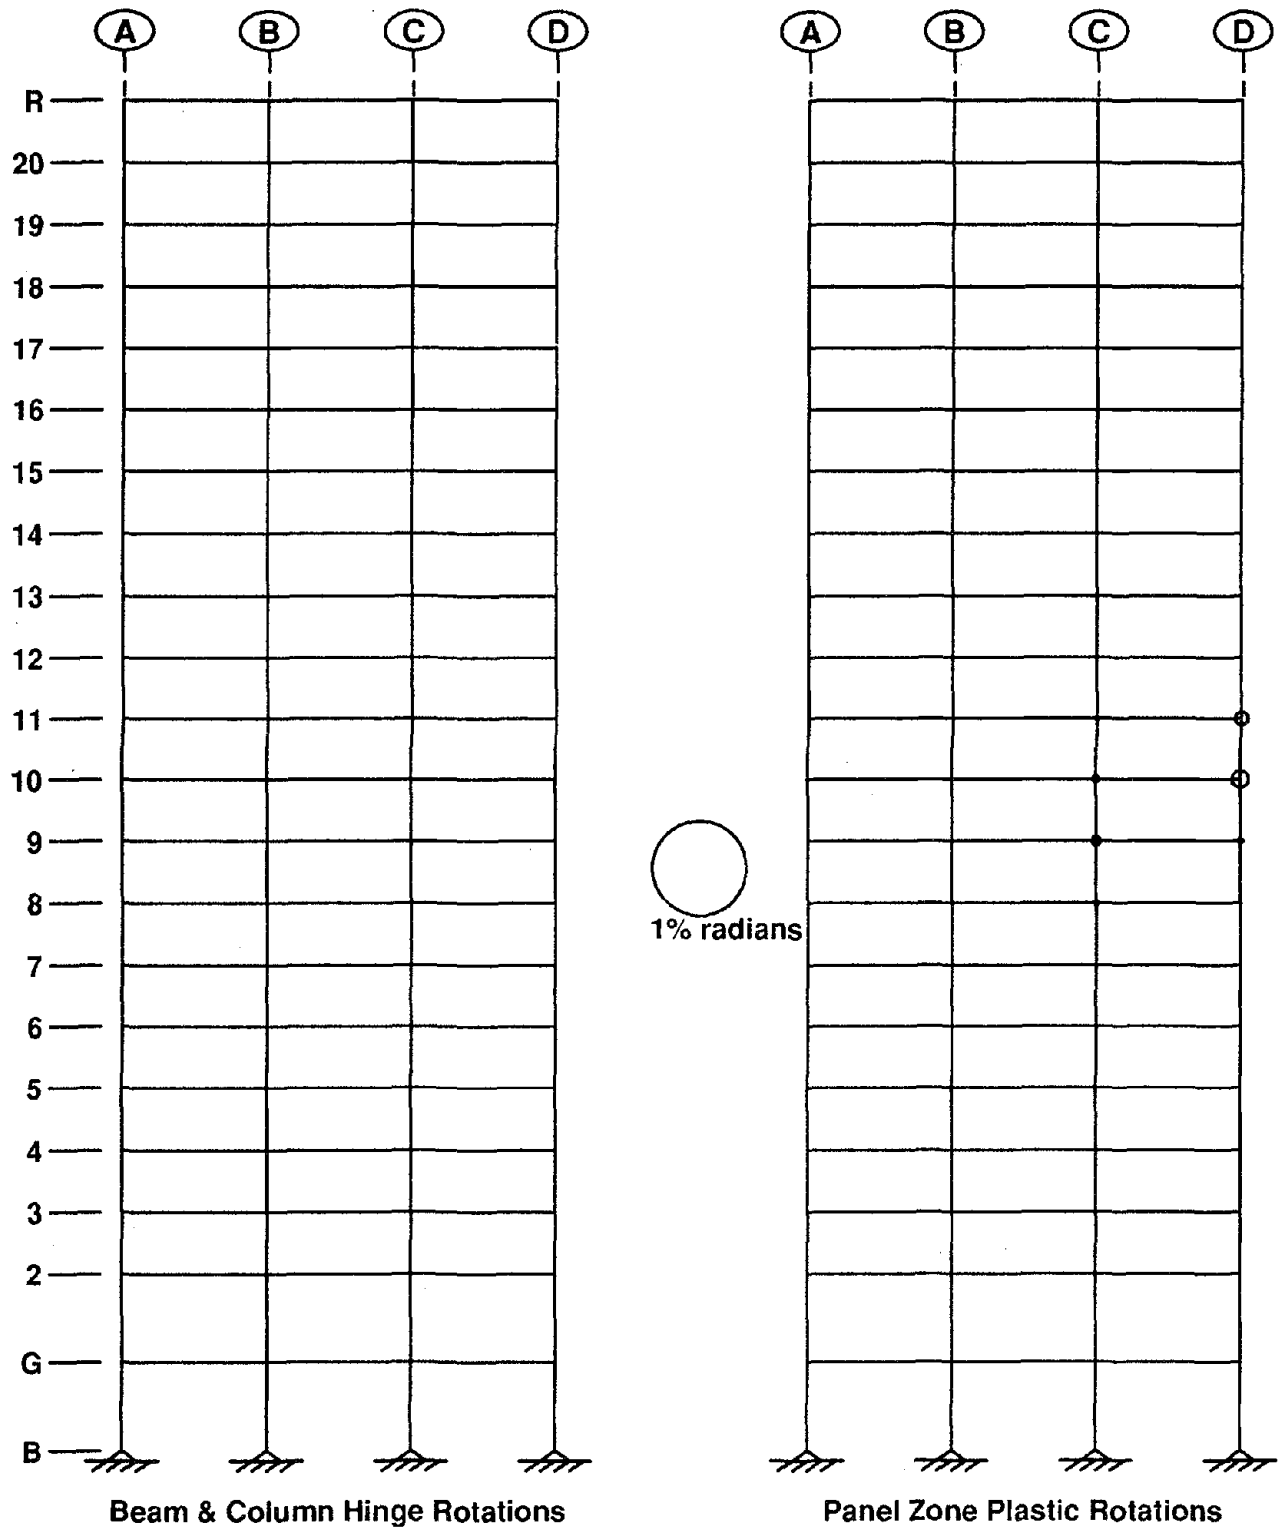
Maximum Beam, Column and Panel Zone Joint Plastic Rotations for MRF Design 2
